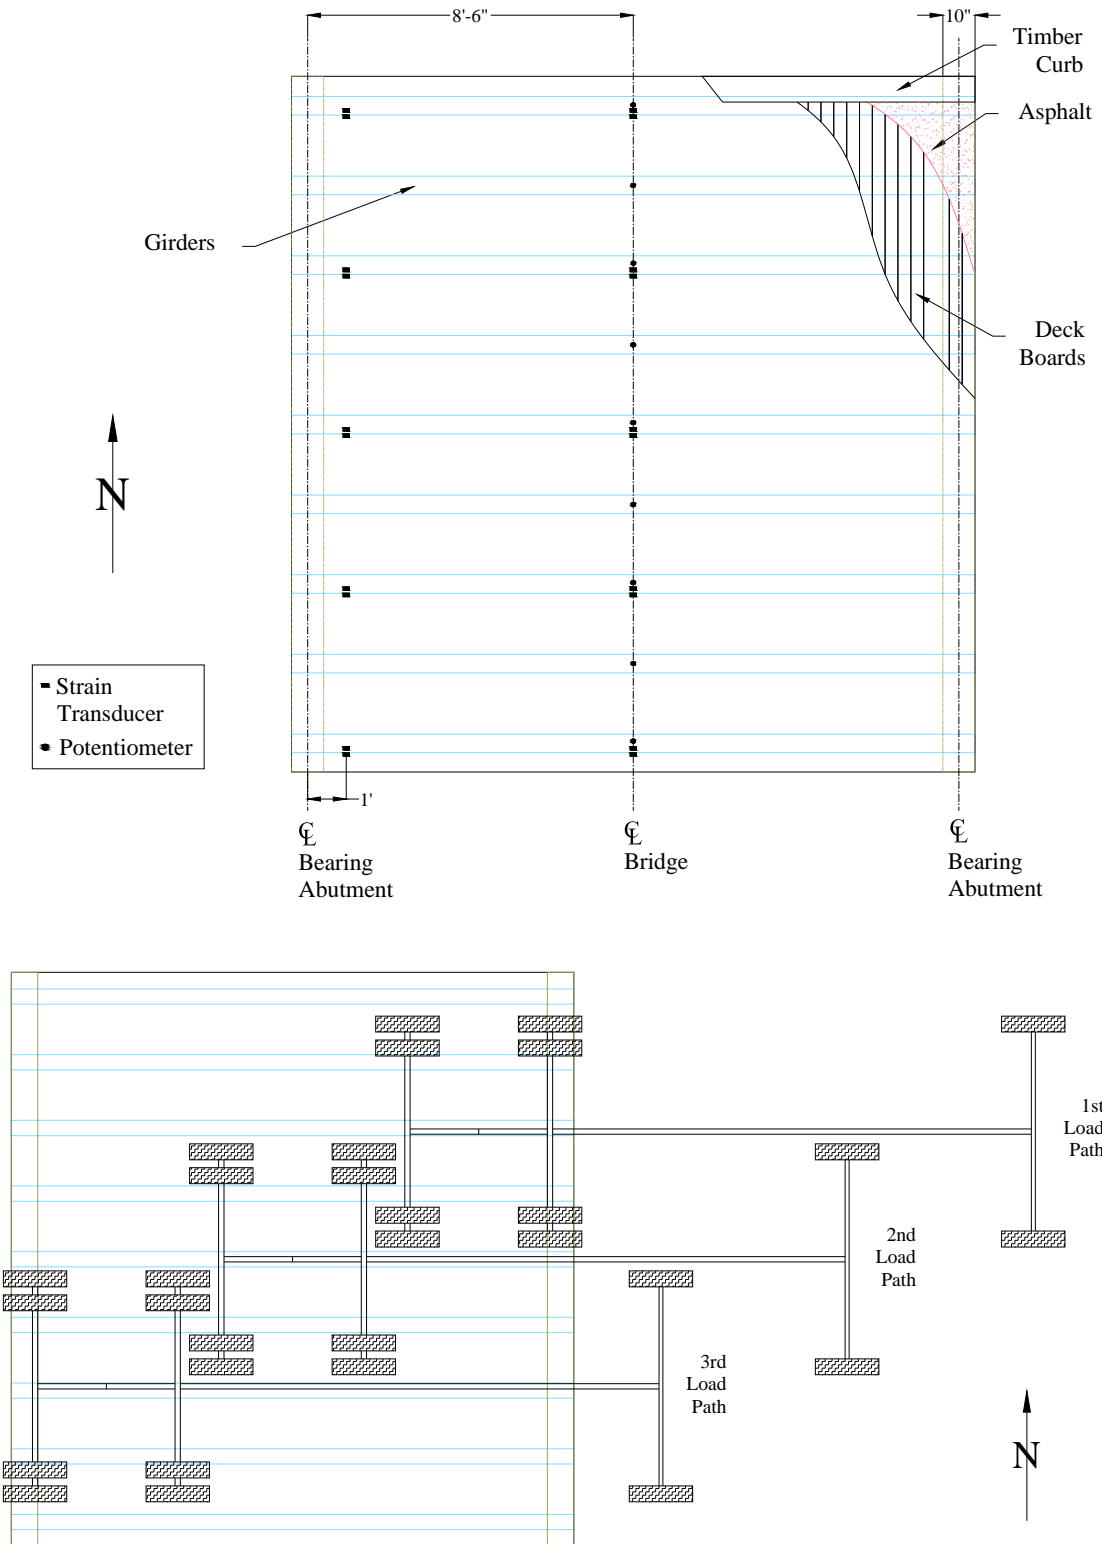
Instrumentation and Load Paths of Dix Creek Bridge
